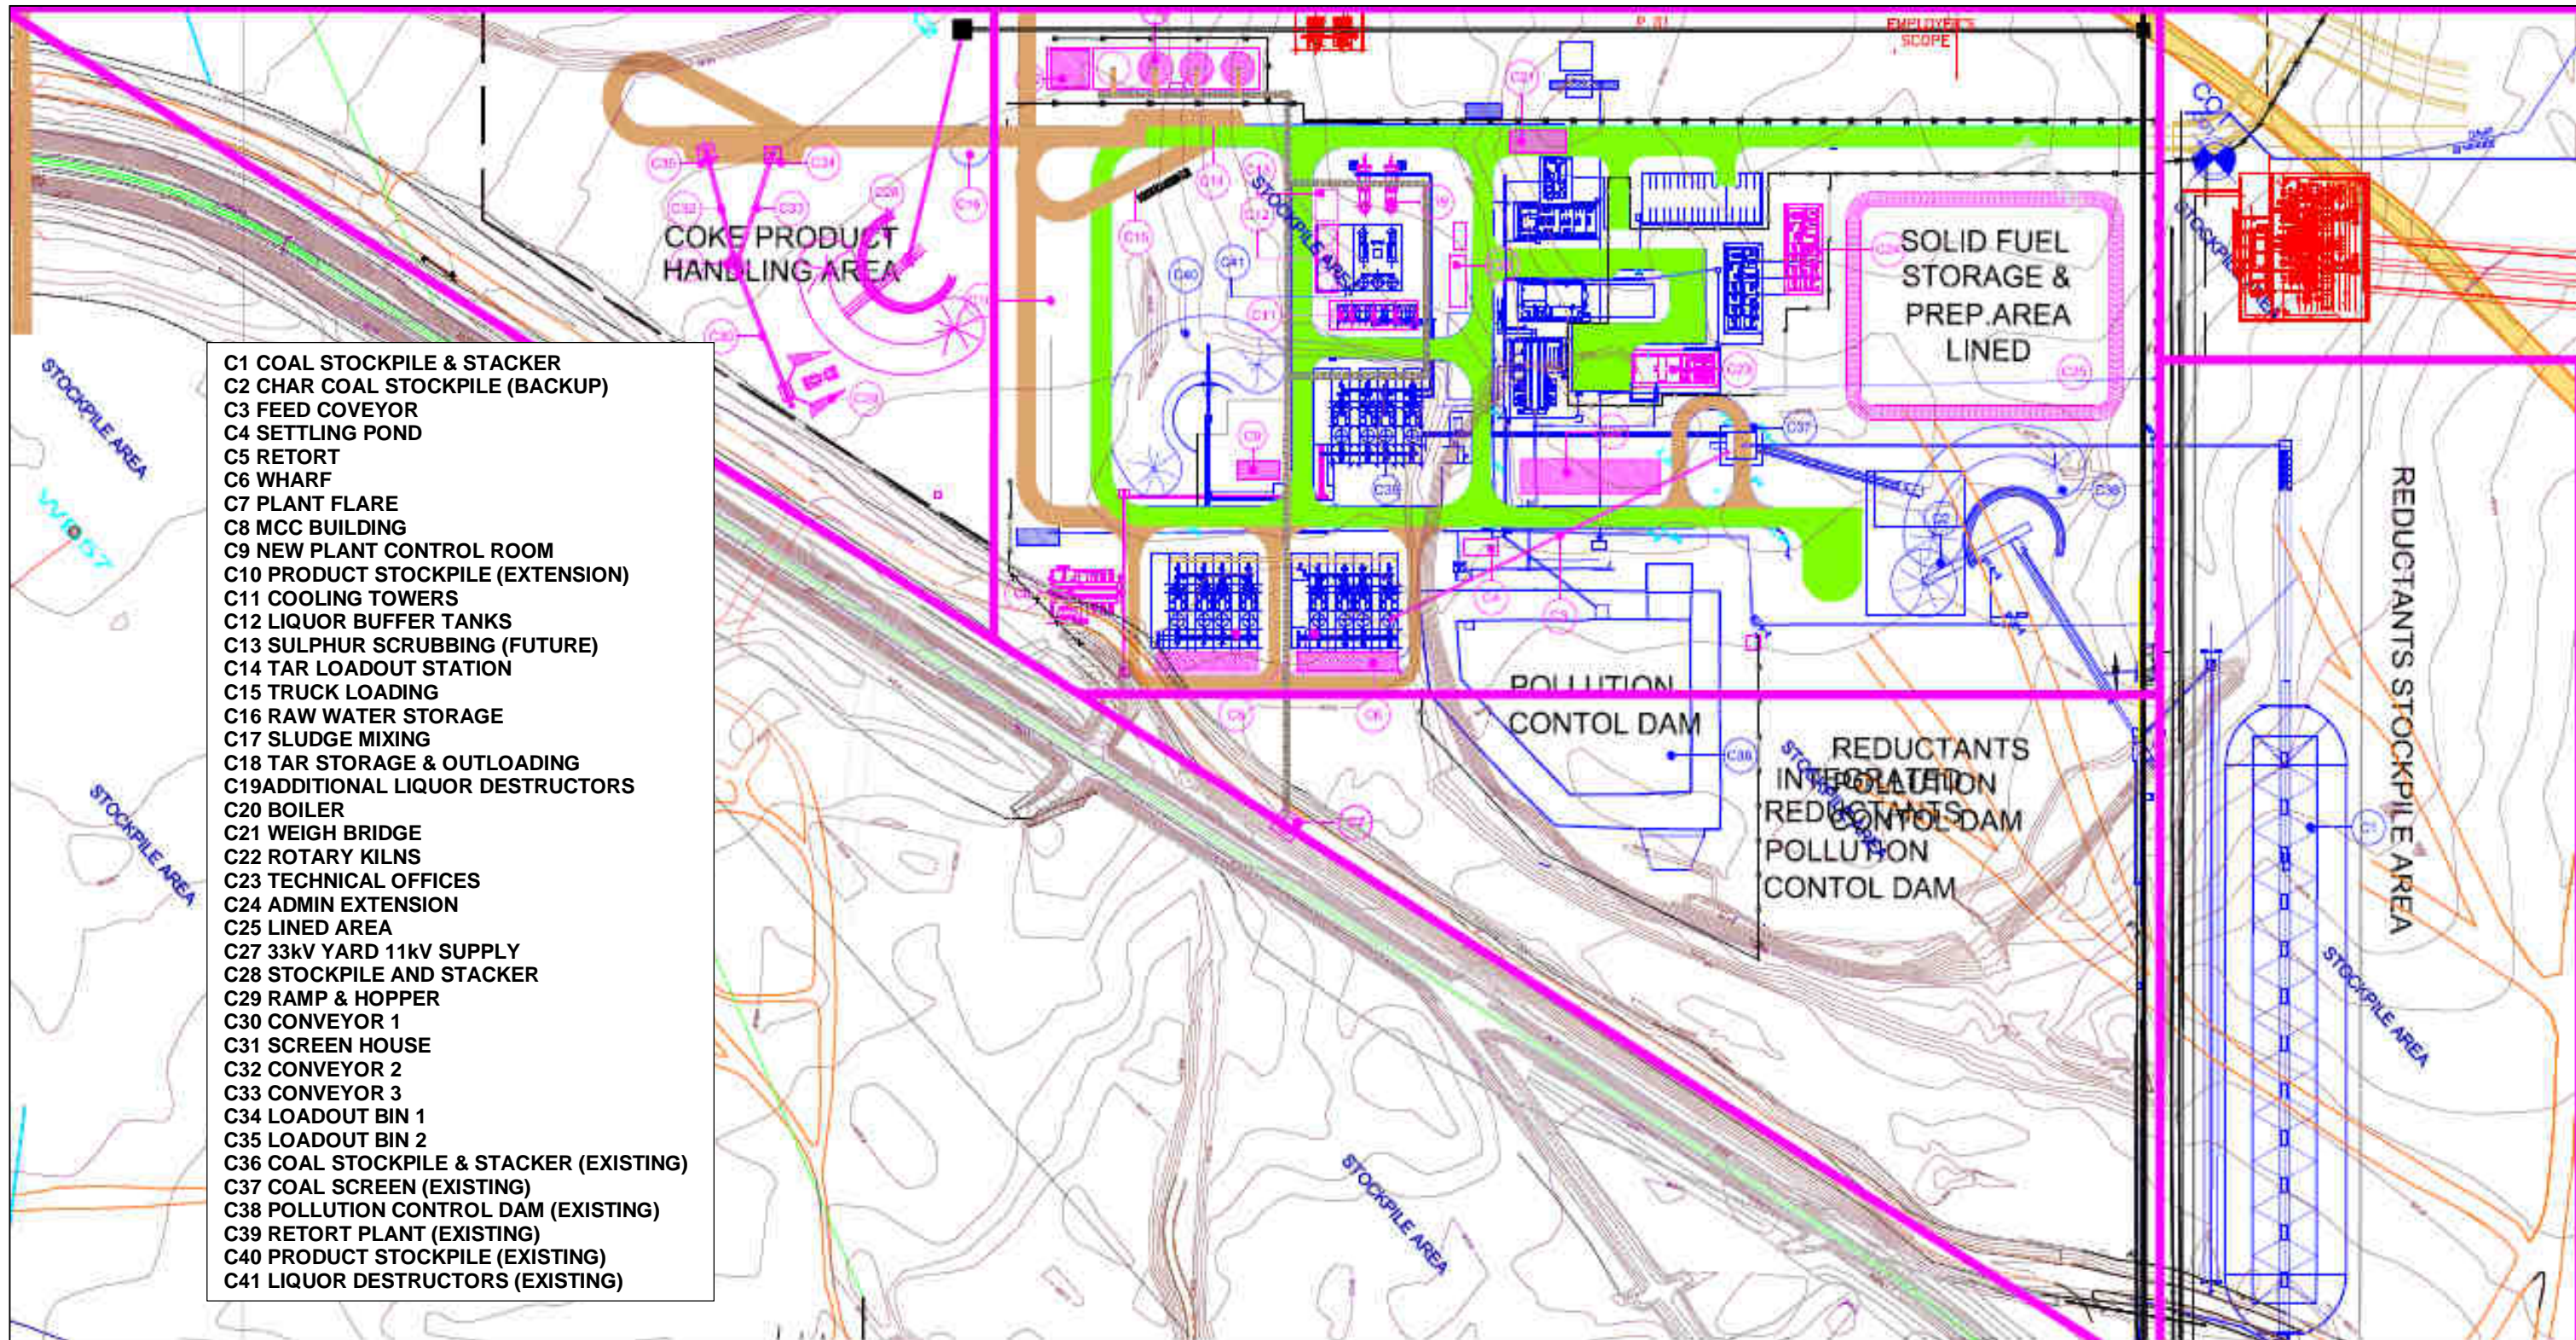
Smaller scale layout of Char Manufacturing Plant Expansion showing plant and stockpile areas
